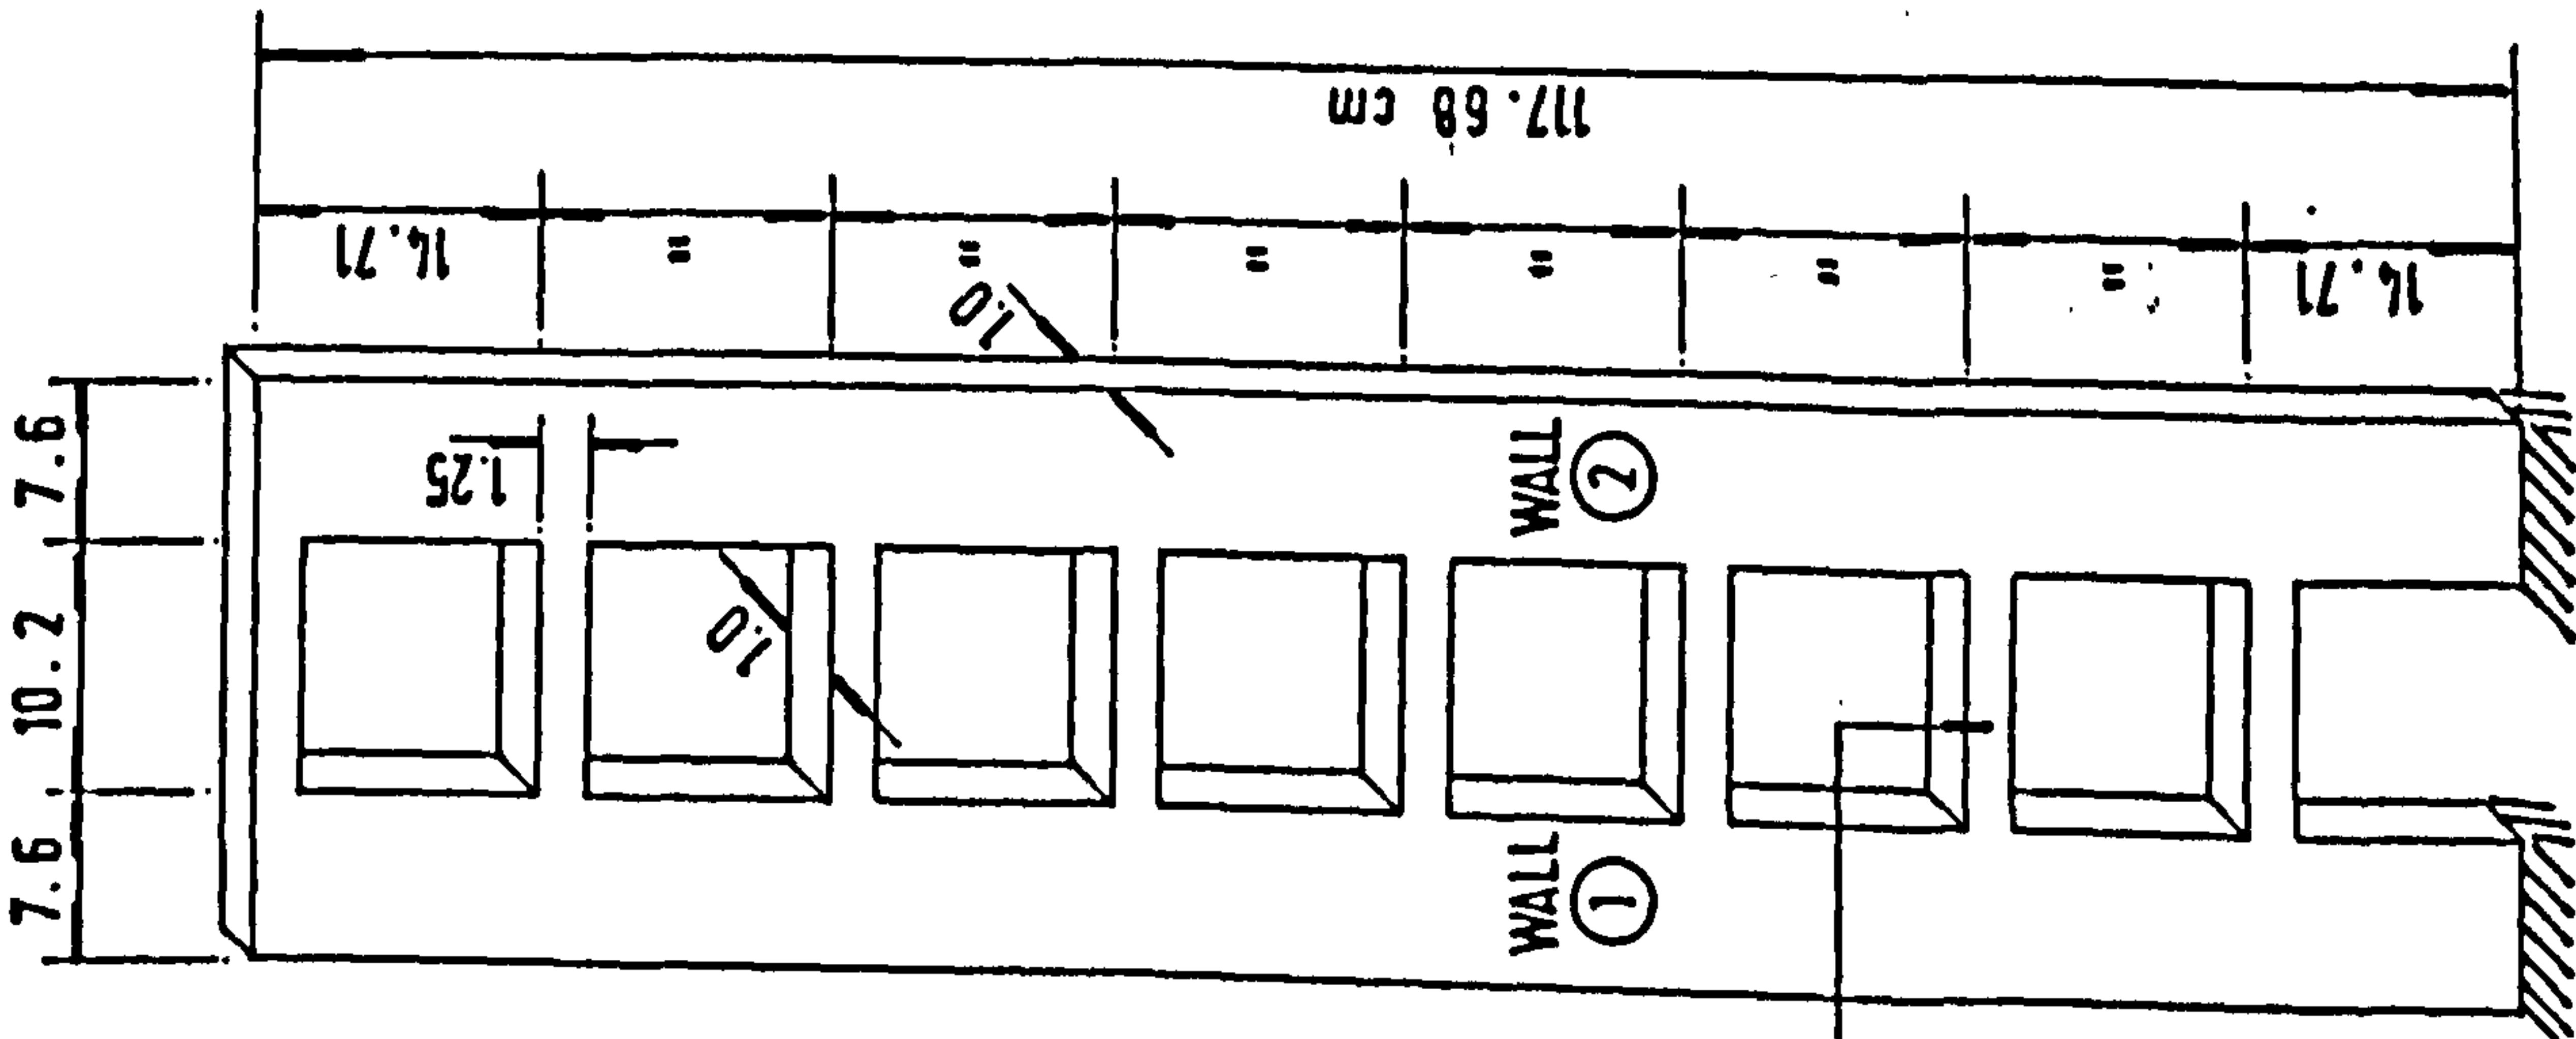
COUPLED SHEAR WALL MODEL ⑨
